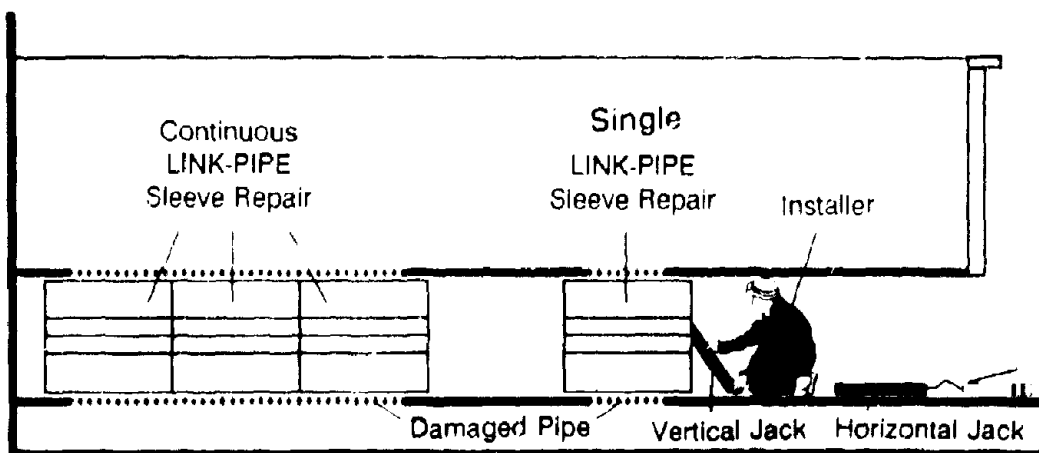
Worker accessible installation of the PVC repair sleeve.⁽²⁾
